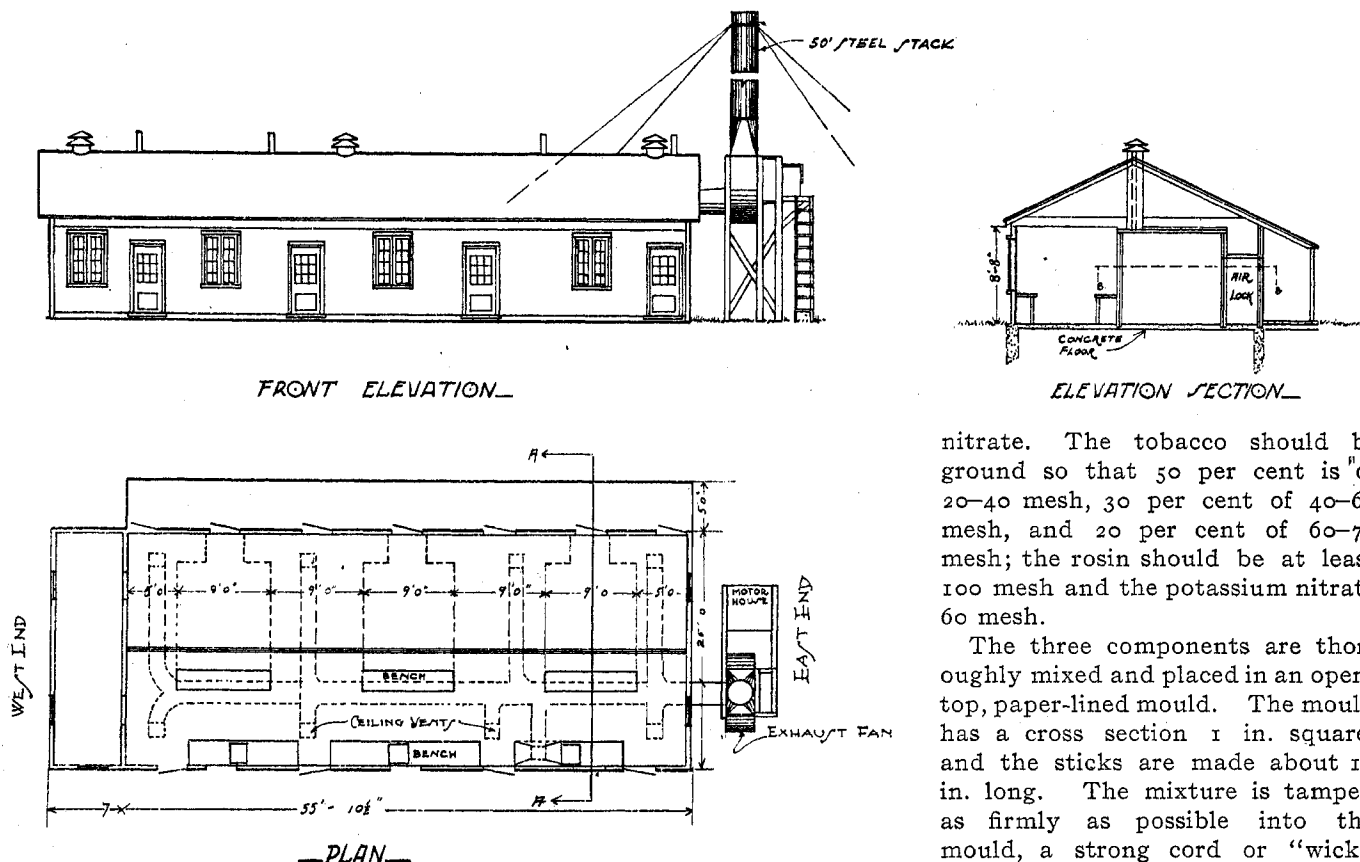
FIG. X—ELEVATION AND PLAN OF MAN-TEST LABORATORY
